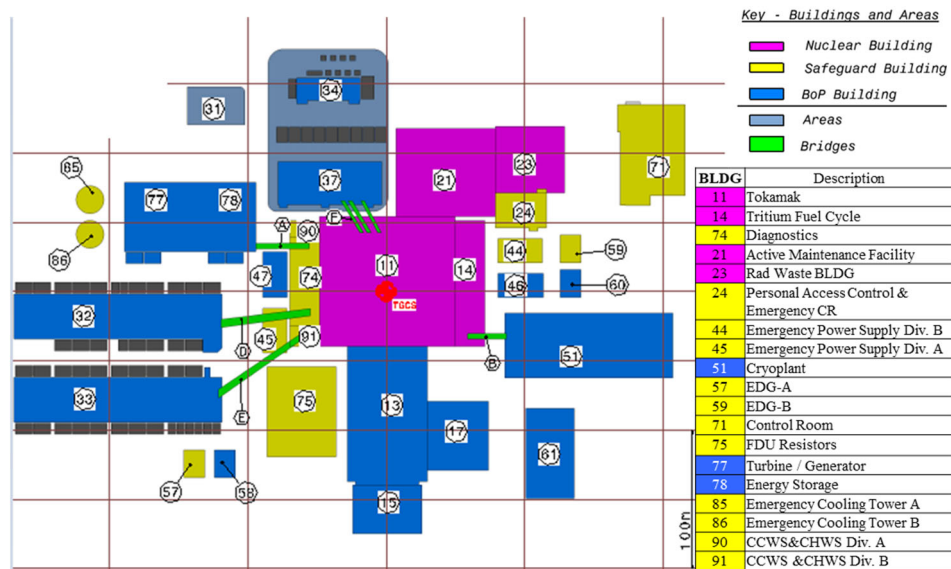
DEMO preliminary plant site layout [53]
